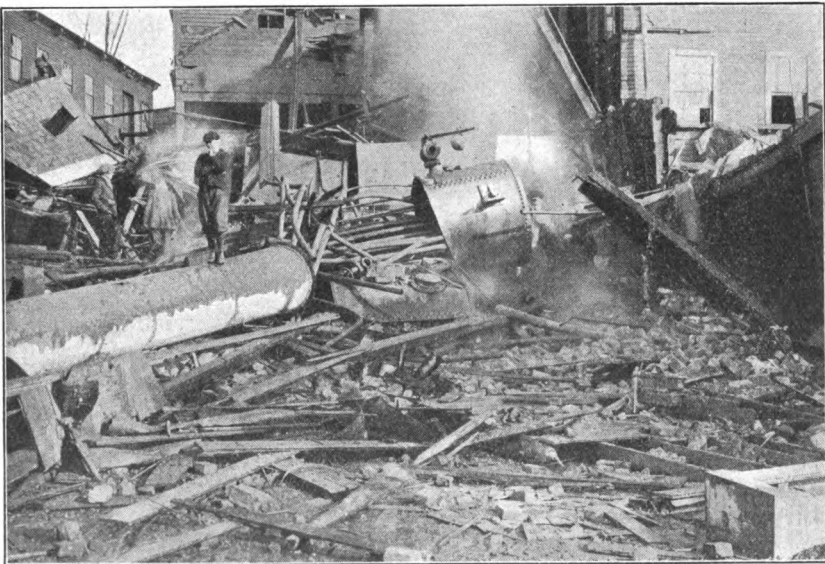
BOILER EXPLOSION AT KEENE, N. H.
